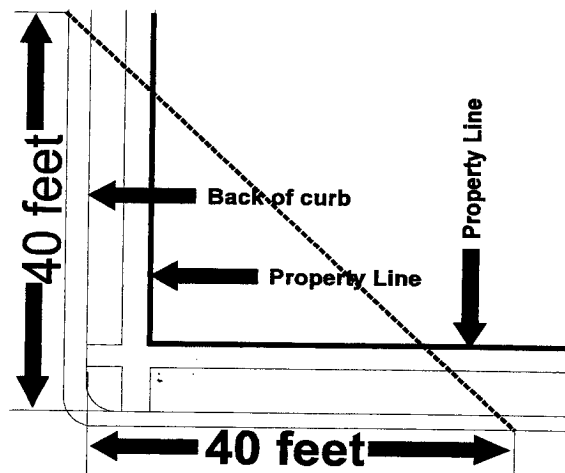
Clearview of intersecting roads, 40 foot clearview zone with sidewalk, curb and gutter.
